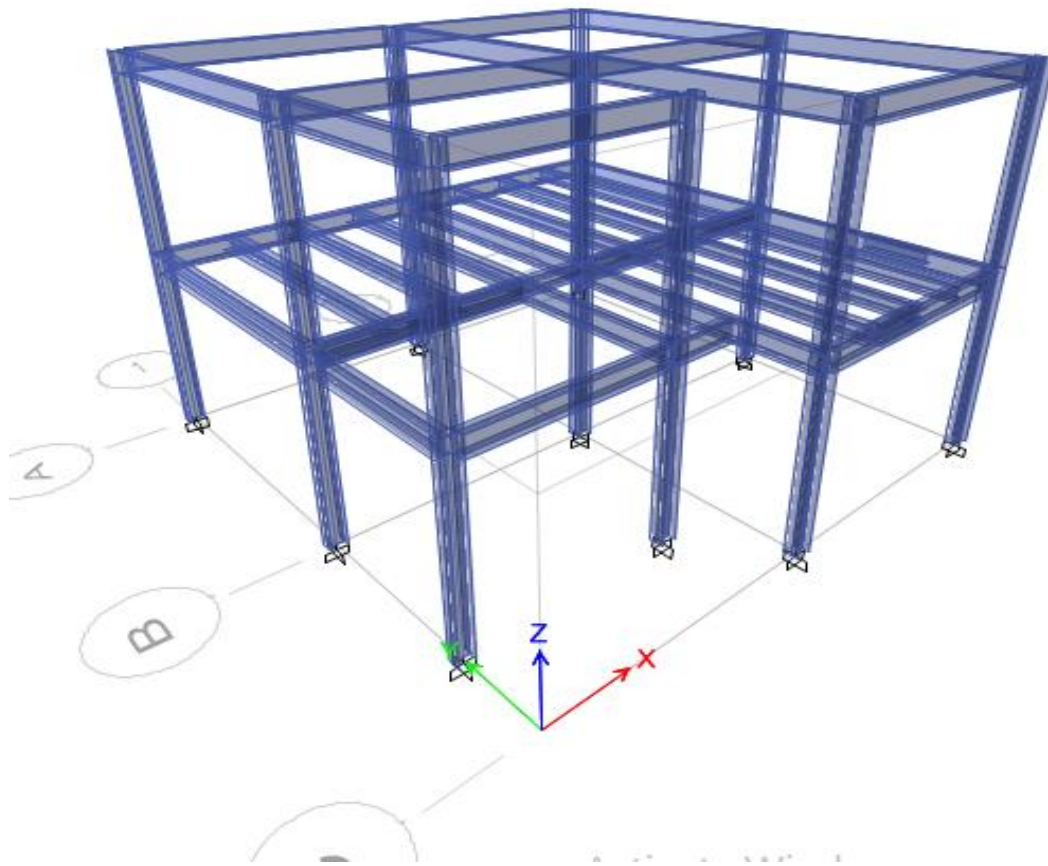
Structural modeling layouts for new proposed steel frame (ETABS 2016 Ultimate 16.2.0)
